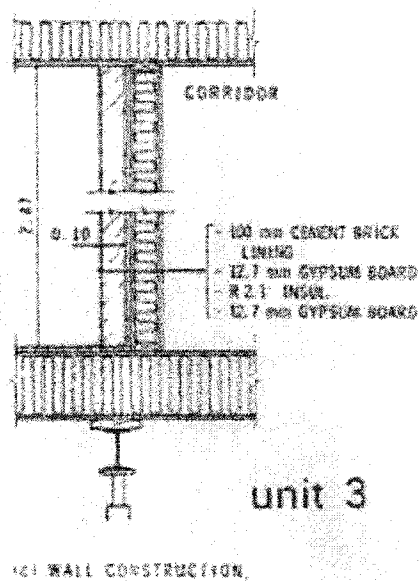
The wall construction of the test unit [from Barakat, 1982]
